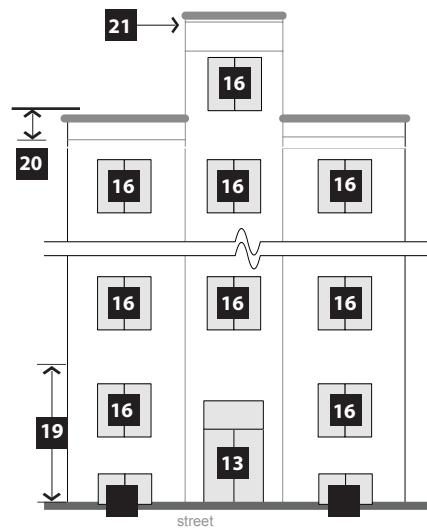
Civic building street facade diagram shown with parapet roof type. Not to scale.
